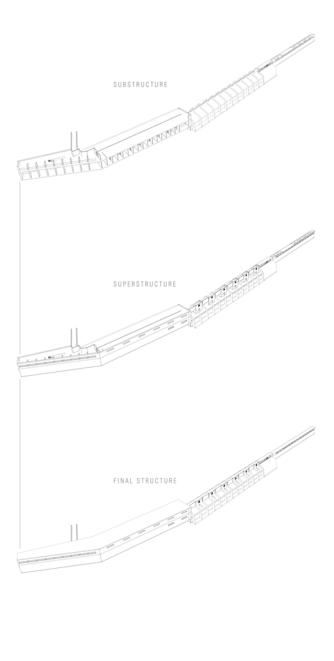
Structural clarification of the Laboratory and Observation deck buildings. (2016)
